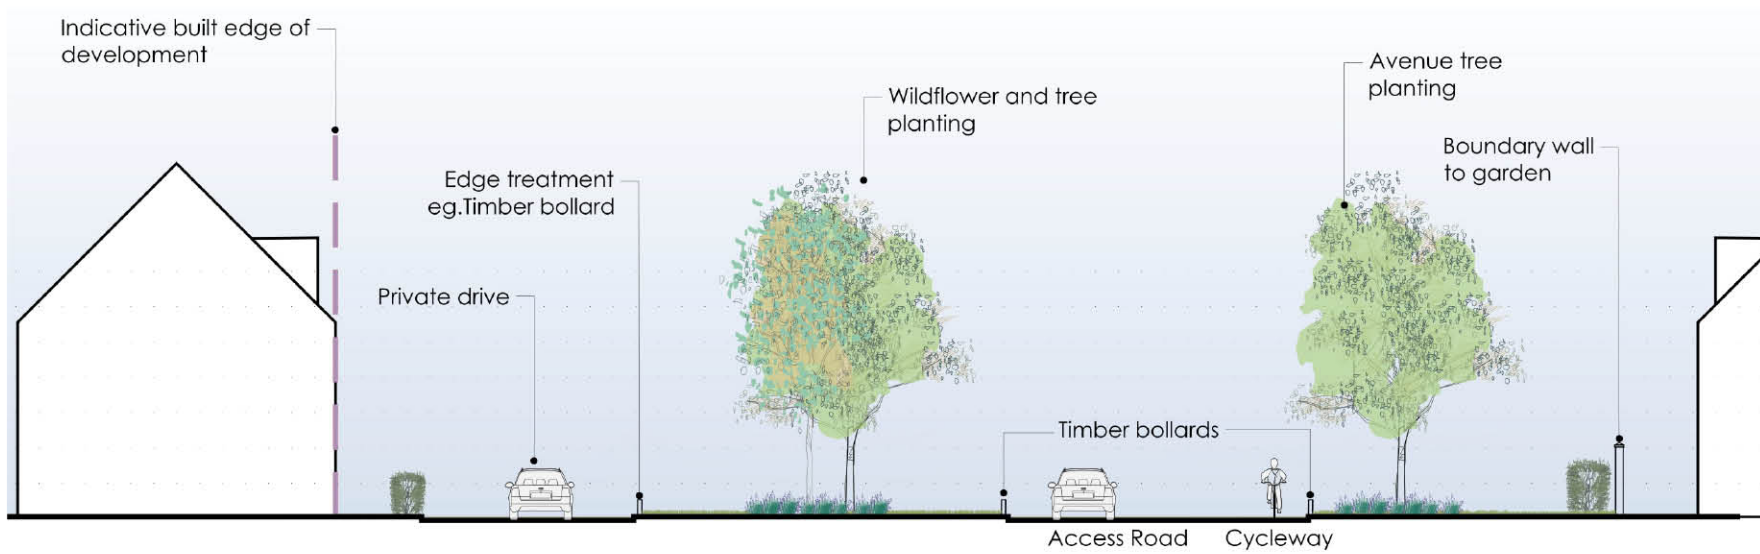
Illustrative Landscape Section B-BB: Section Through Access Road and Green Corridor
